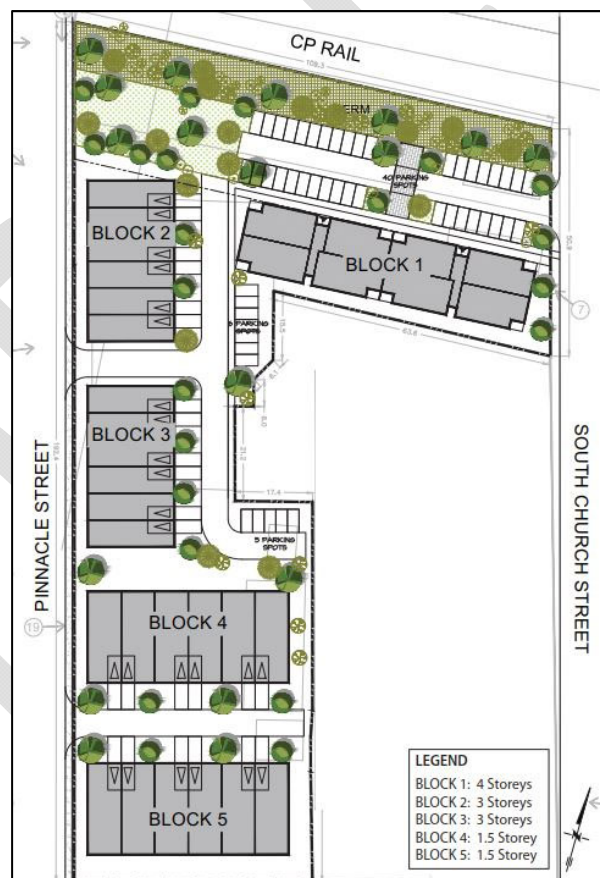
Site Concept Plan for 105 Pinnacle Street (not to scale; image source: Hobin Architecture Incorporated)
